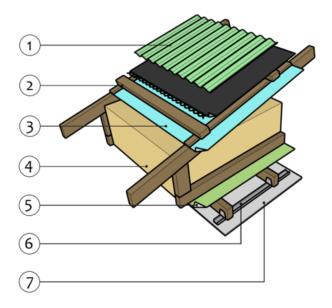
Element showing (6) timber blocking and metal batten system forming a ceiling service cavity.
